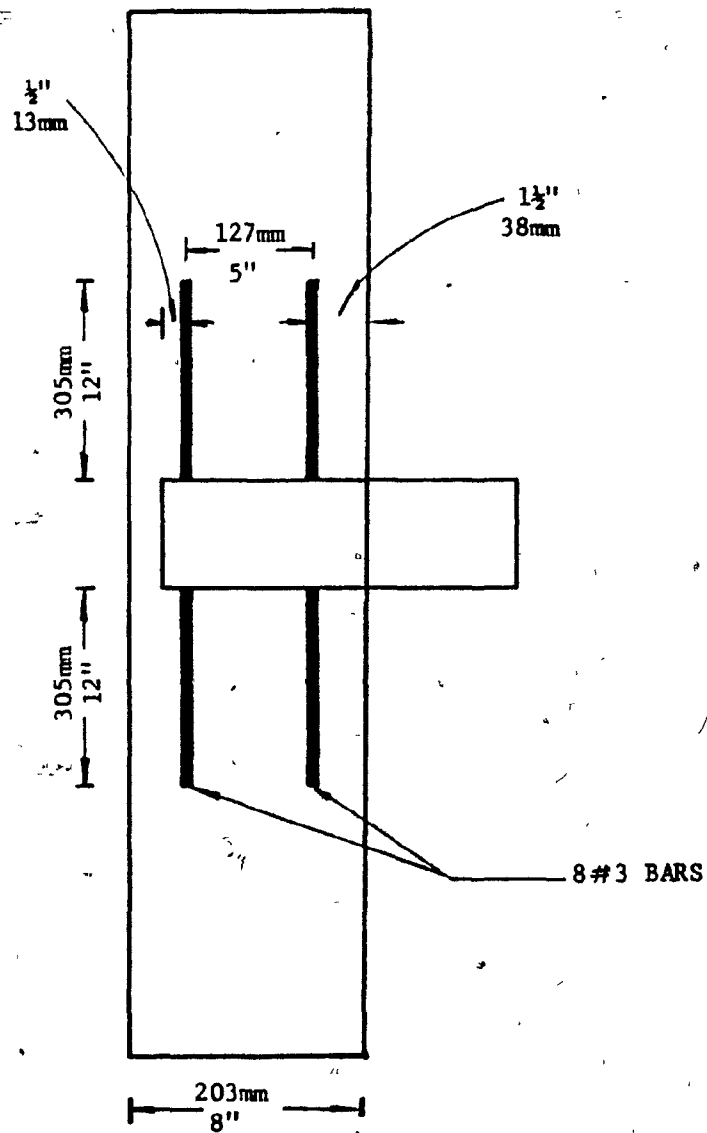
Test specimen with additional welded reinforcement
